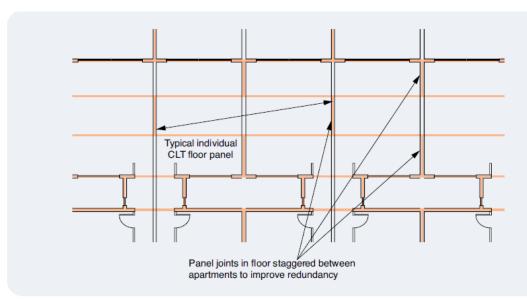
Staggering floor joints in CLT buildings is good practice for robustness.
